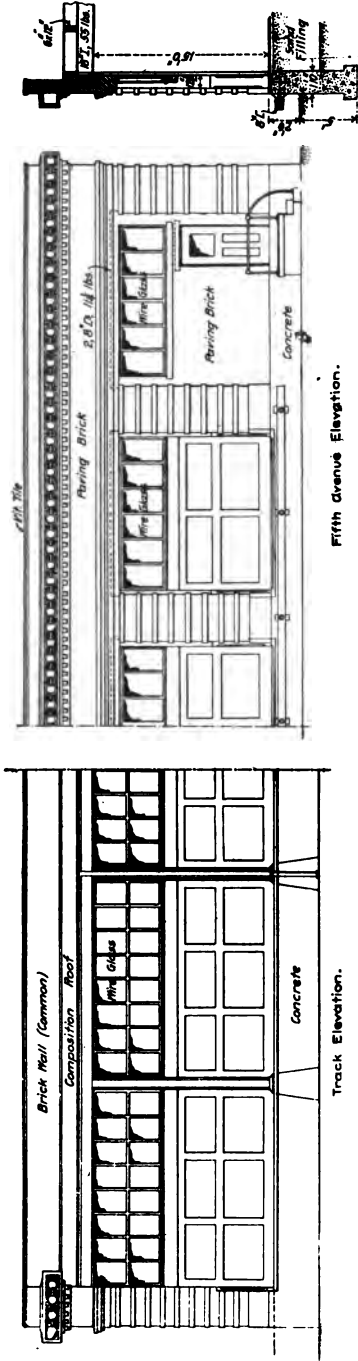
Part Elevations and Section Through Side Walls of B. & O. Freight House.
